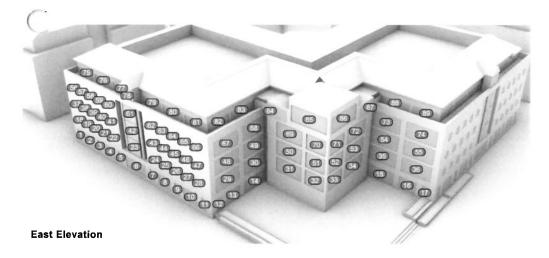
View of model of commercial building 1GQ, locating of windows assessed for VSC.
